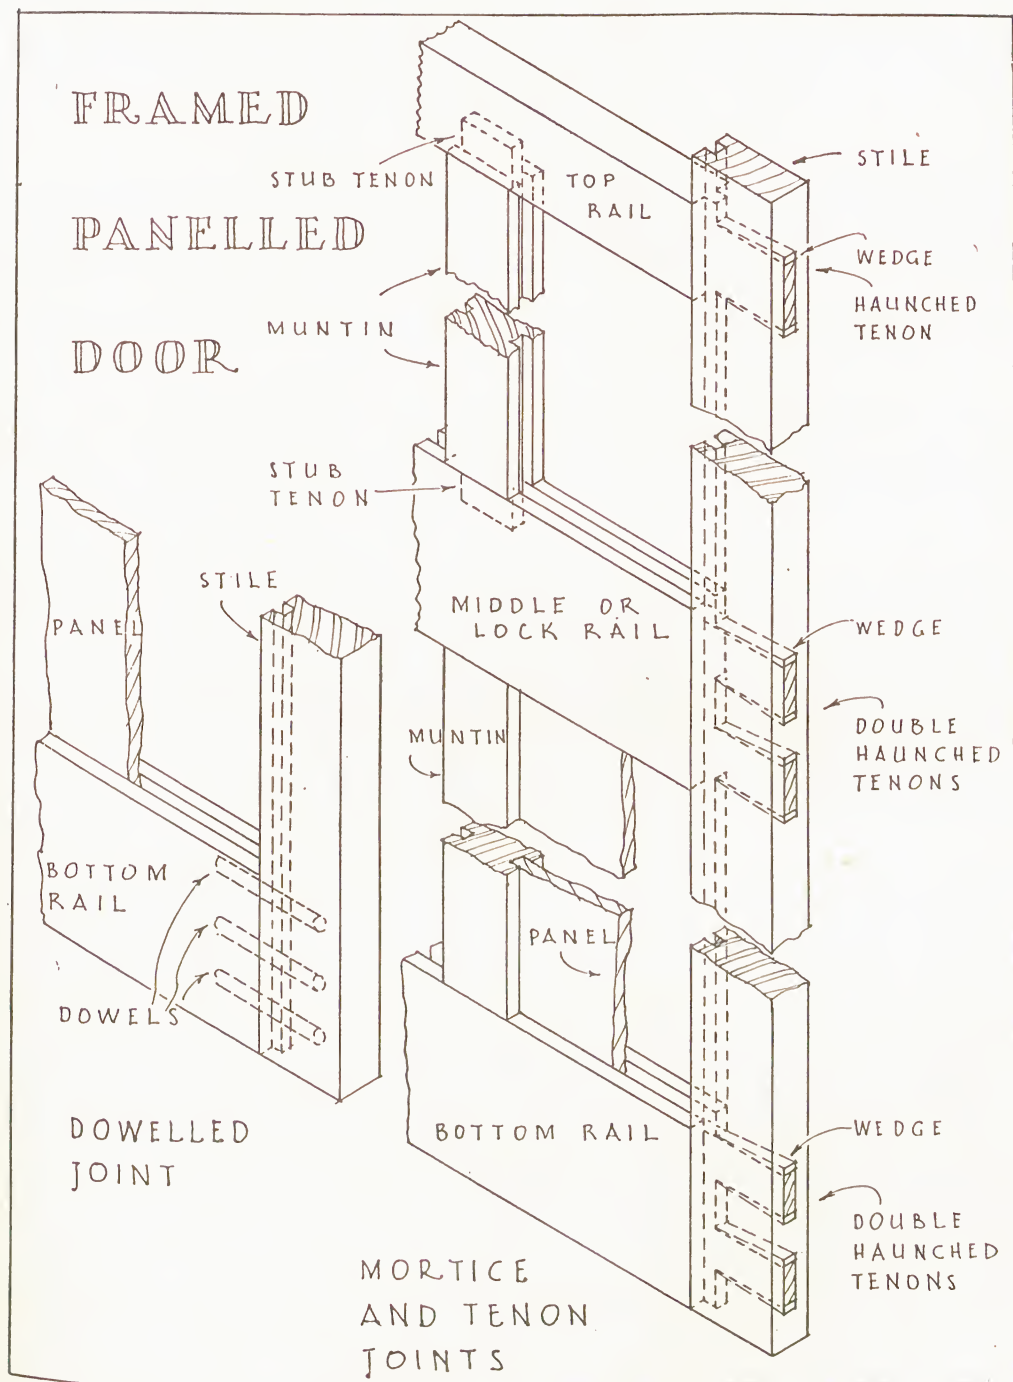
Isometric drawing of typical door joints. The dowelled joint is used in machine-made doors.
